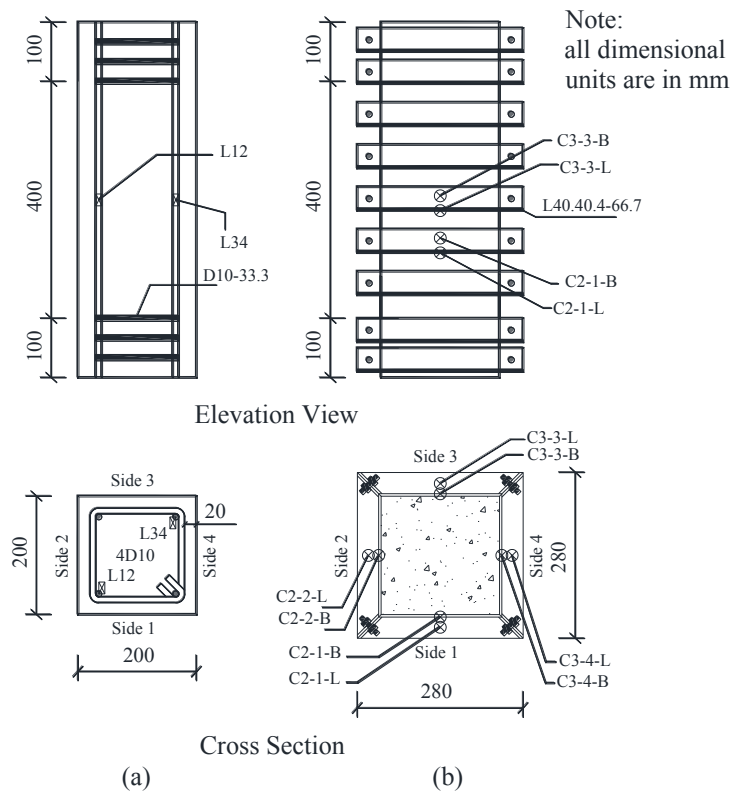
Elevation view and cross section of Specimen S02 : (a) reinforcement details ; and (b) external steel collars
